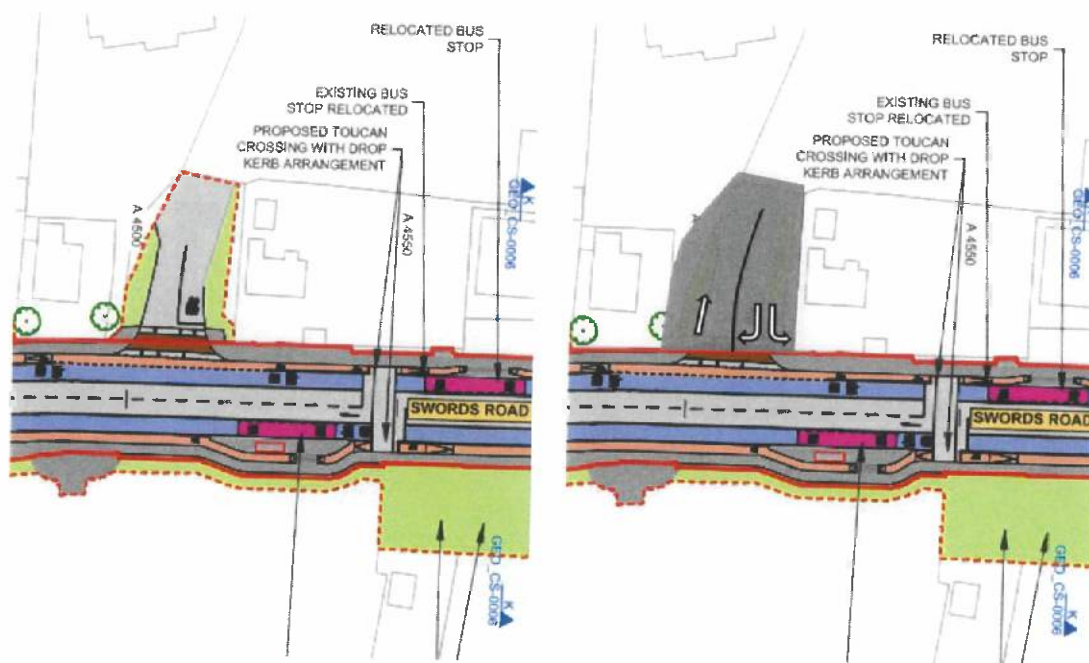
Revised entrance/exit arrangement (l) and existing entrance/exit arrangement (r).
